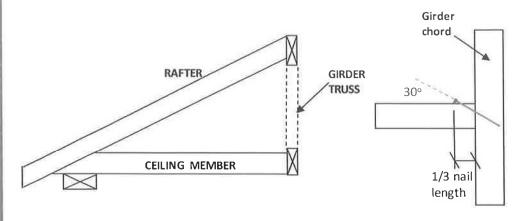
Toe-Nailing Rafter / Ceiling Member to Girder Truss
